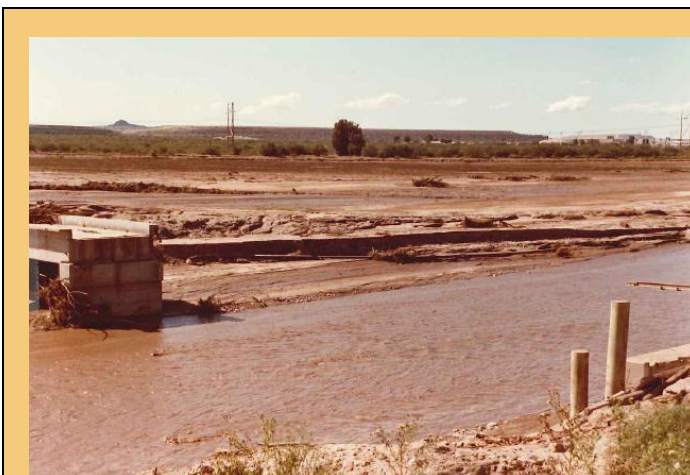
1993 bridge damage at UPRR spur crossing.
